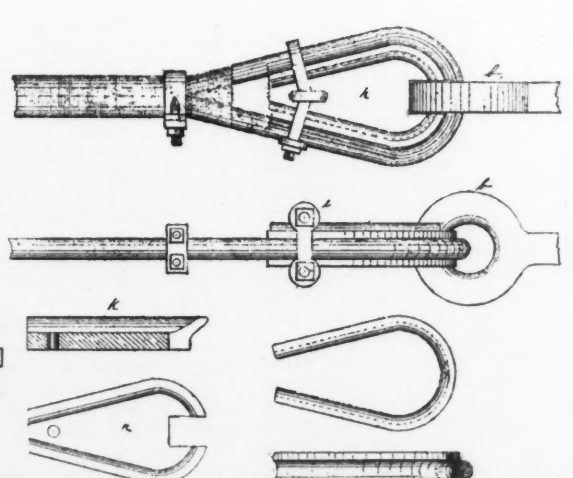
ENLARGED DRAWING OF ANCHORS; OLD LEWISTON & QUEENSTON BRIDGE.
